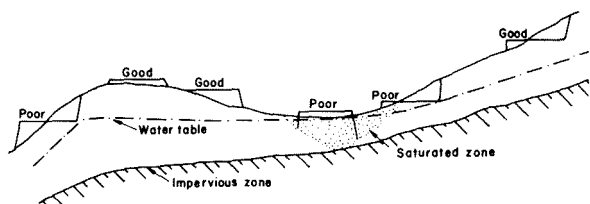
Good and poor road location sites for avoiding subsurface drainage problems.
